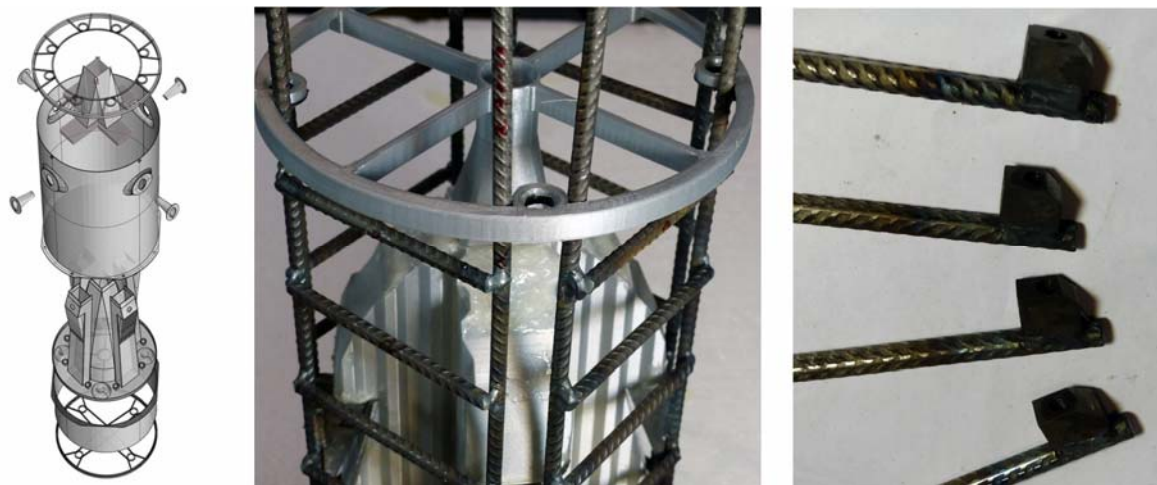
Illustration of a 3D printed mould for a column-column connection (left); reinforcement cage (centre); tig-welded flag plates on the clips (right) [sources: Ledderose]
